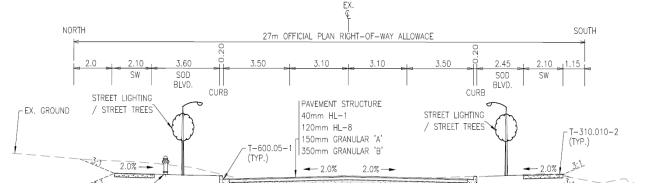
Alternative Design 4B: North and South Sidewalk
